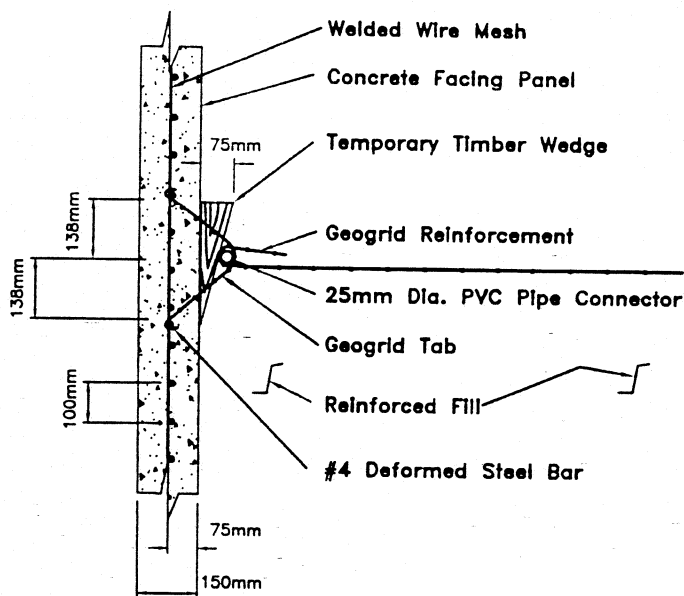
Geogrid Facing Panel Connection (from Berg et. al., 1986)
